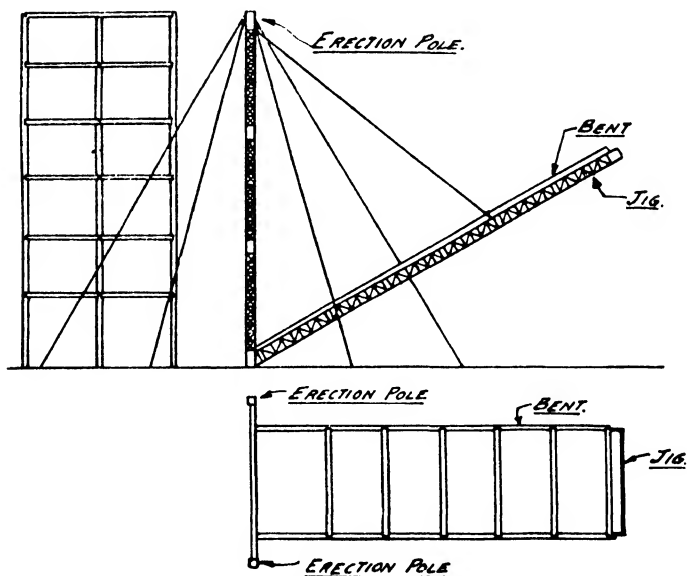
ERECTION OF SIX-STORY BENT OF STEELWORK IN ONE PIECE
